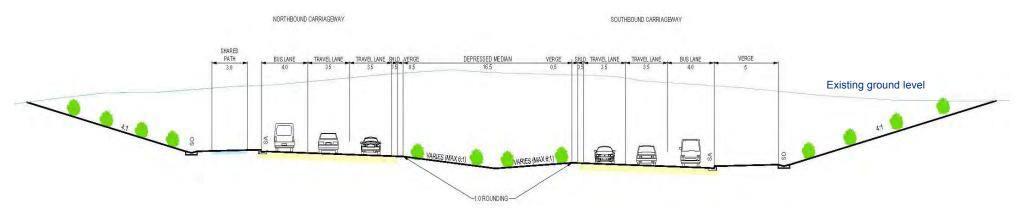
Indicative cross section and elevation of the proposed cut, about 500 m north of Vicar Park Lane (about chainage 3500)
